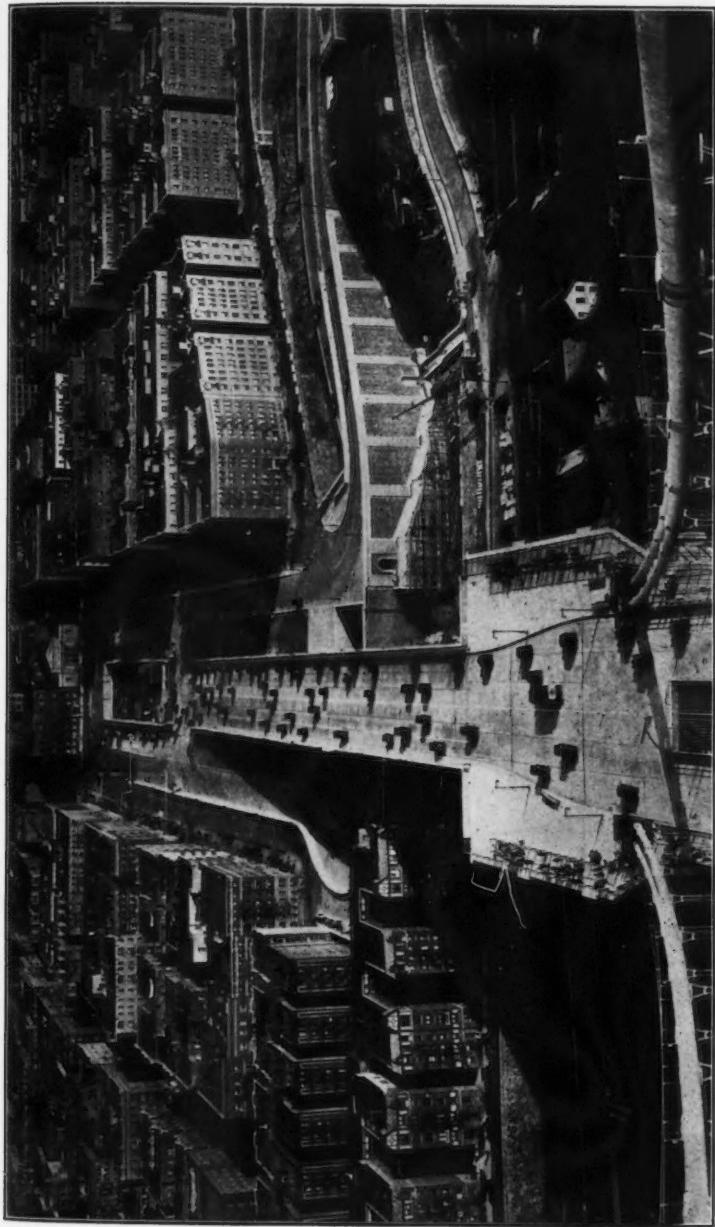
VIEW OF TRAFFIC OPERATION ON NEW YORK APPROACH, LOOKING EAST FROM TOWER.
